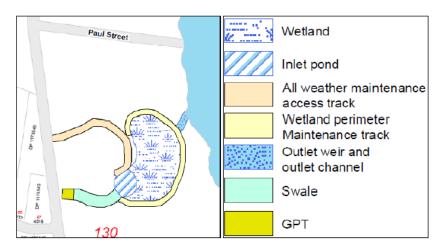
Indicative location of proposed stormwater infrastructure on 130 Hall Street, Pitt Town
